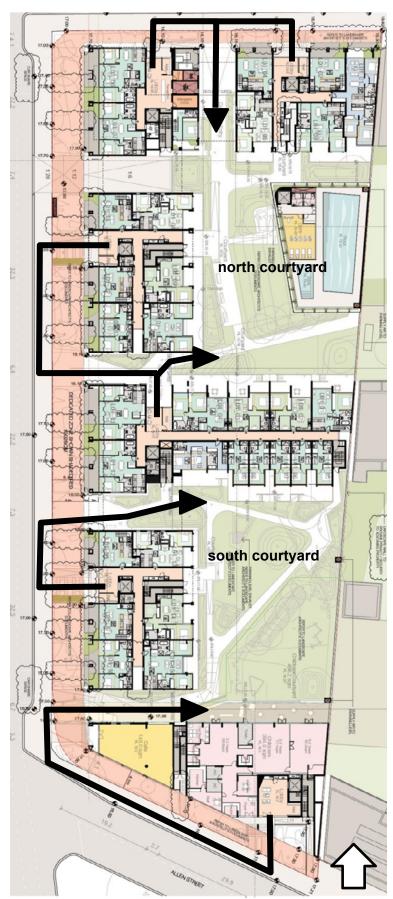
Ground floor plan showing proposed routes residents would need to take to access their respective communal courtyards.
